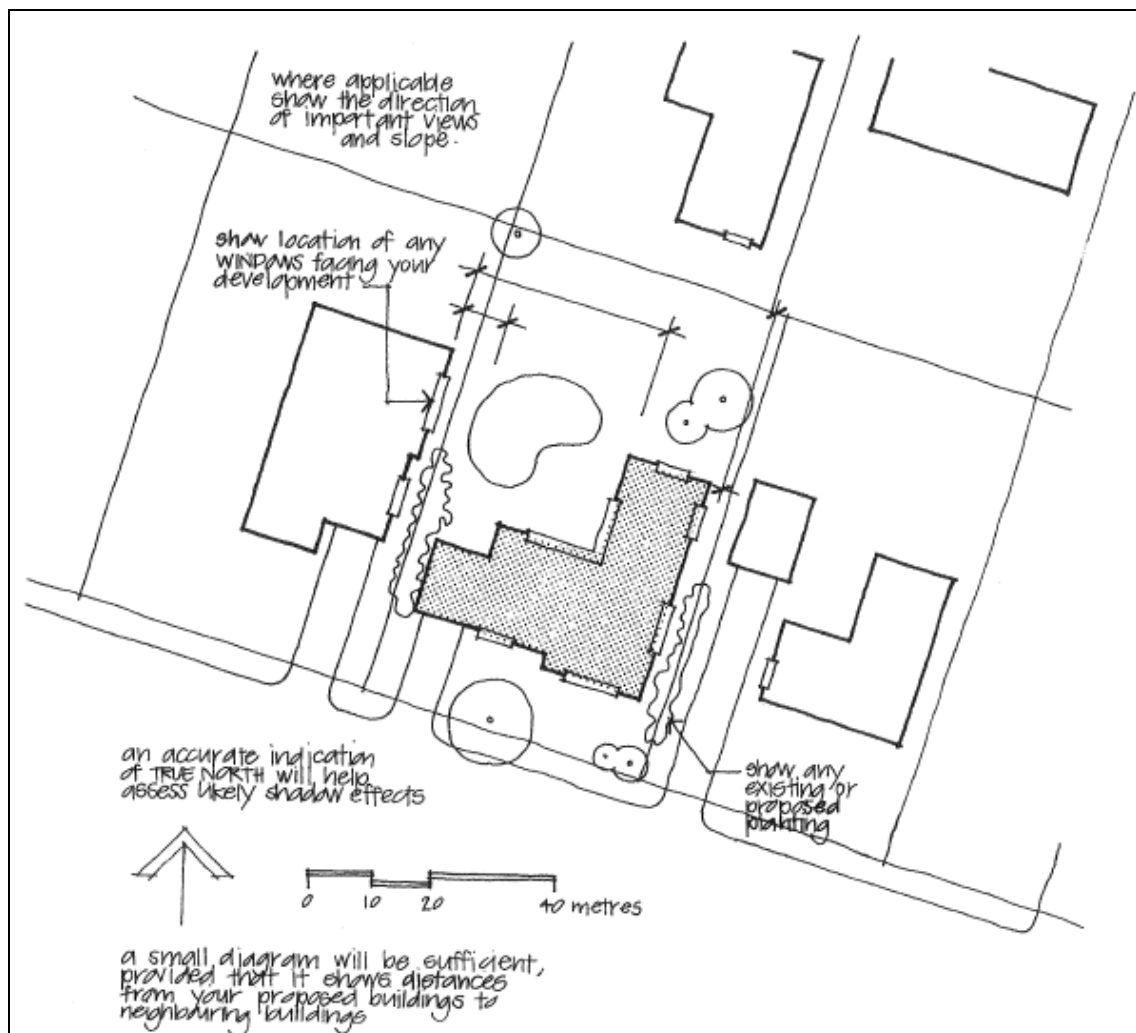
Sample Plan – Existing features on-site and adjoining (Residential)
